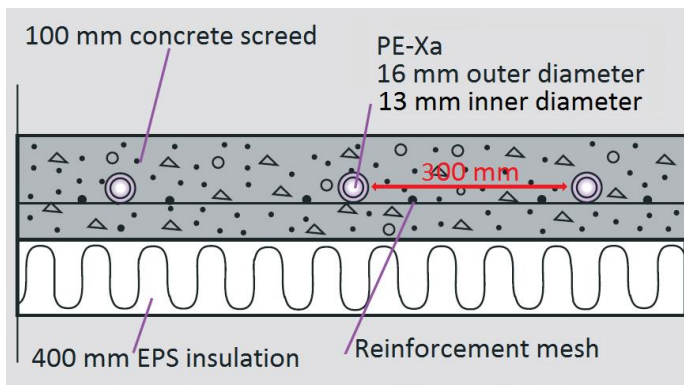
Concrete screed embedded pipe under floor heating (EnovHeat case study house).
